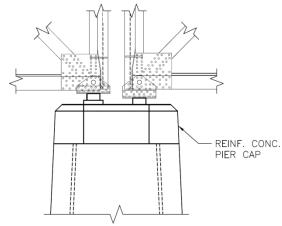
Stage 3 Pier Retrofit The jacks are removed and the jack points are filled with reinforced concrete.
